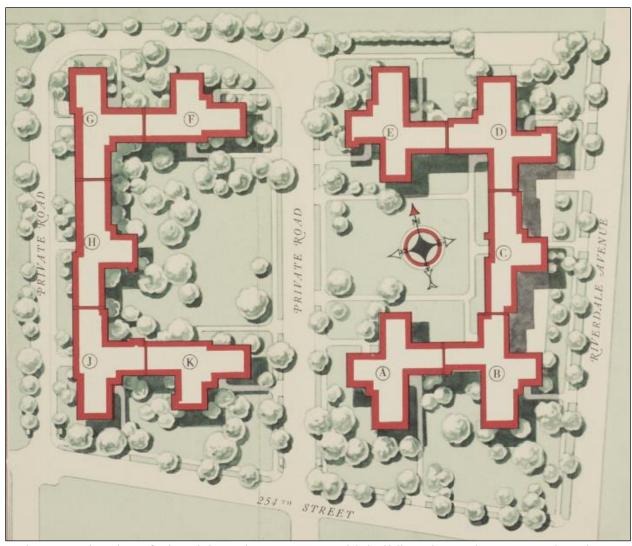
Site plan of Riverdale Park Apartments with buildings lettered A-K, note there is no building I (Riverdale Park, Inc 1940). Not to Scale.
